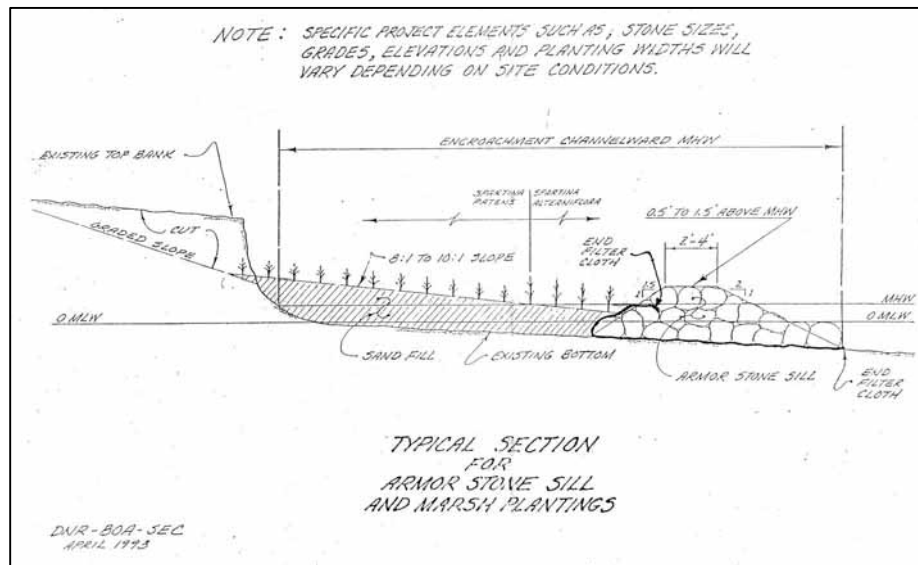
Typical Cross Section for Sill (DNR, 1993)
